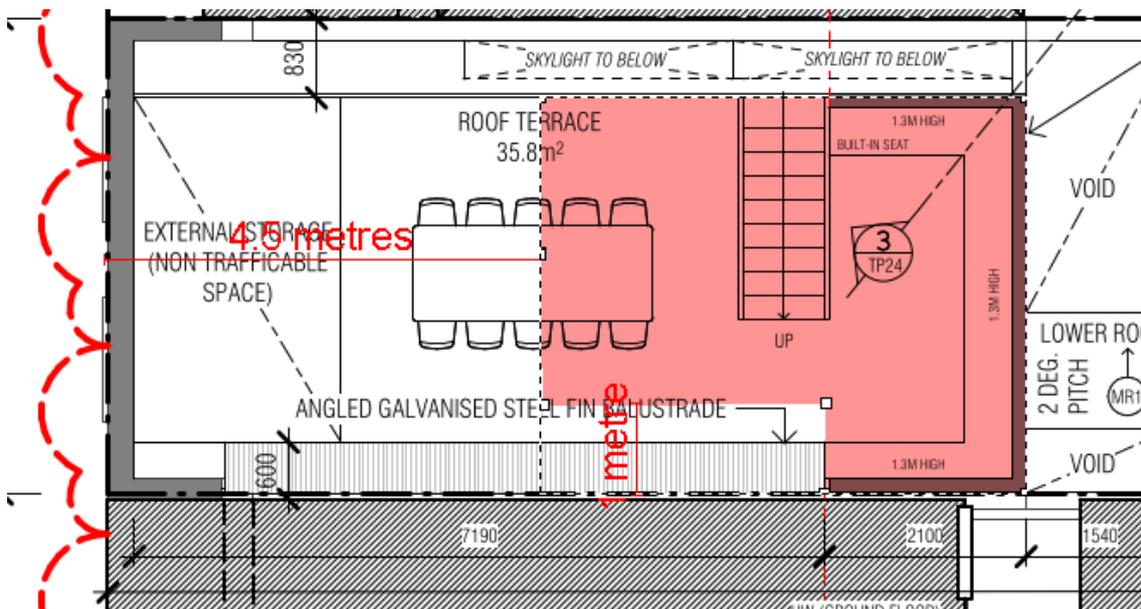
The roof terrace subject to recommended condition (source: Decision Plans, edited by Council Officers)
